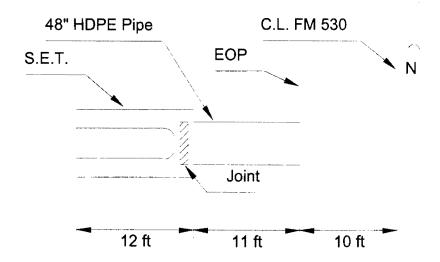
Plan View of the Section with a Dislodged Gasket in Installation Y3.
